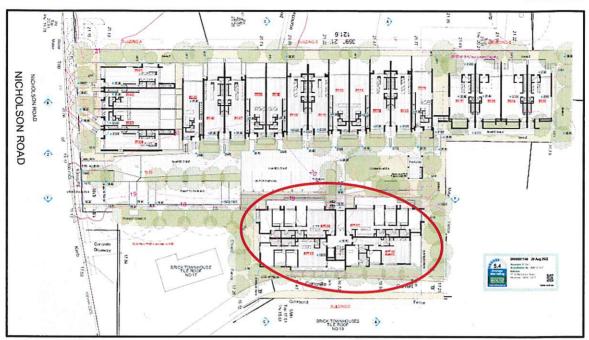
EXCERPT OF SITE PLAN SHOWING RFB BUILDING (SOURCE: POPOV BASS)
